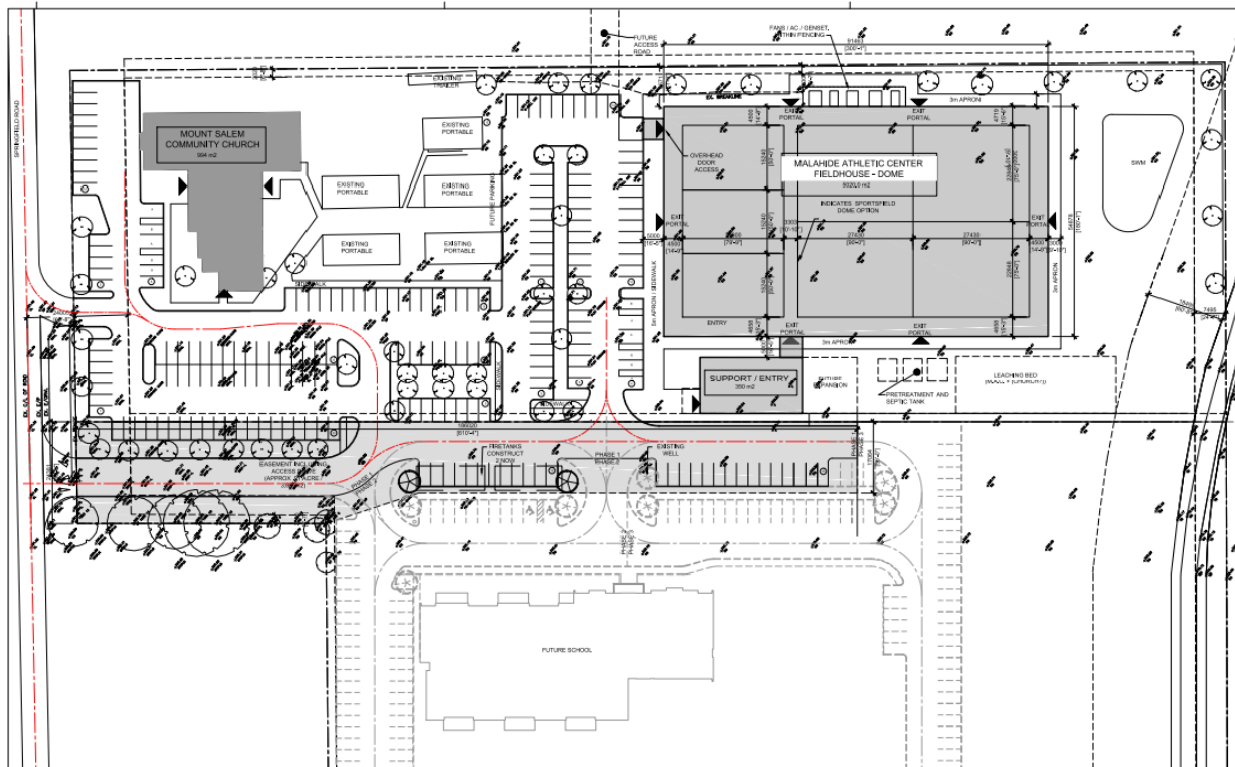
Proposed Site Plan (a+ Link Architecture Inc.)
